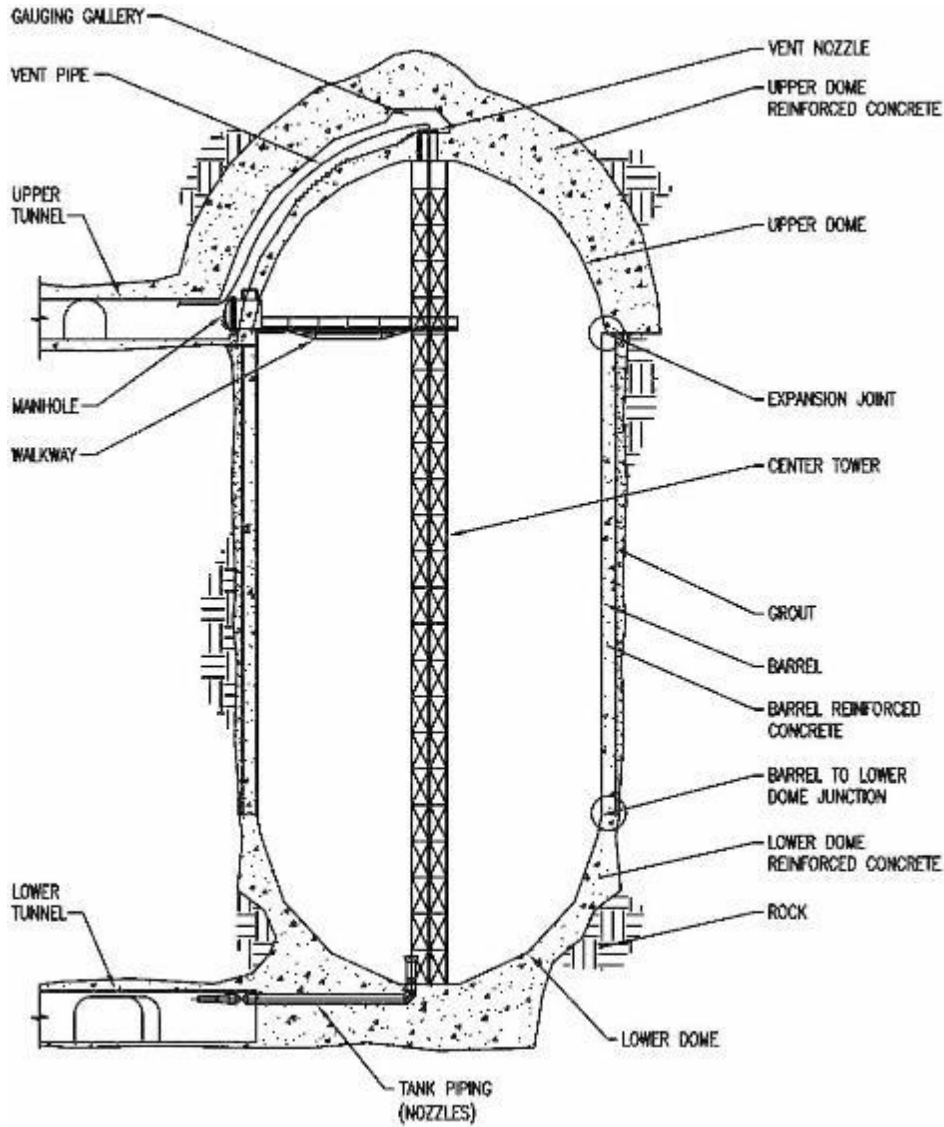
EXISTING TANKS 1-4 ELEVATION
